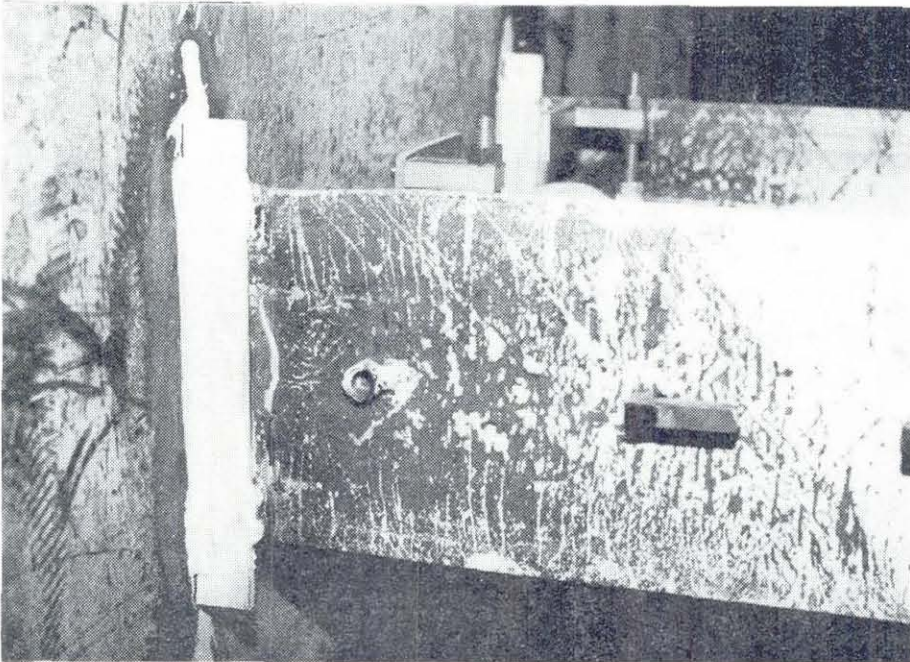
Fracture of Beam Bottom Flange (Specimen 17)
